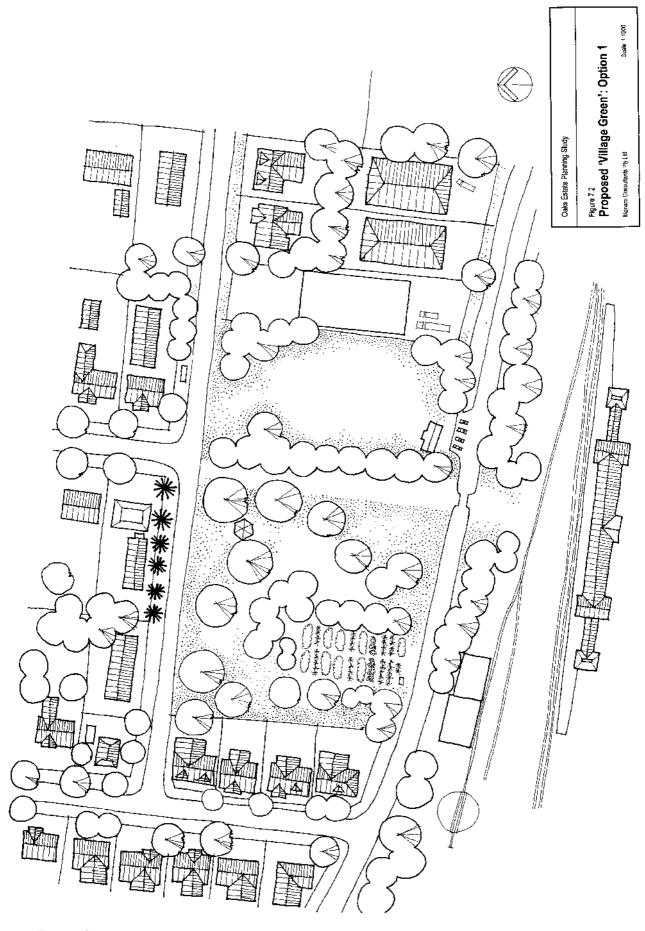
PROPOSED 'VILLAGE GREEN': OPTION 1
